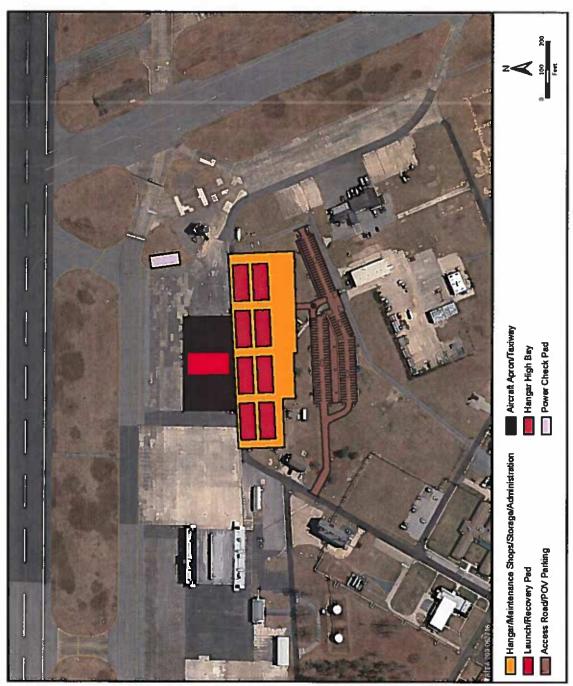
Wallops Flight Facility: Proposed Construction and Infrastructure Improvements
